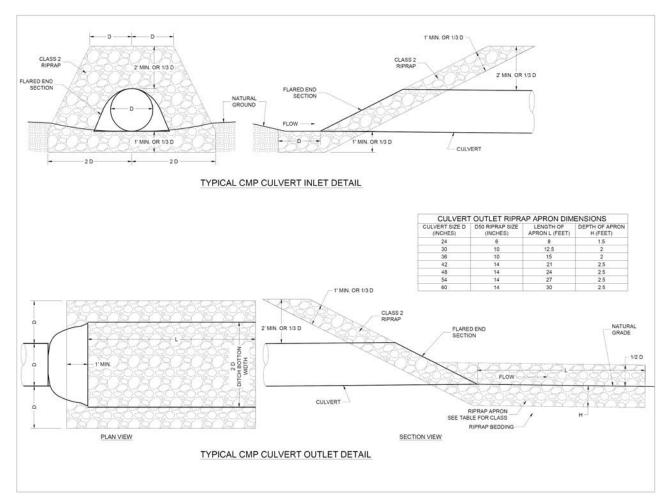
Typical Minor Culvert Inlet and Outlet Protection Detail
